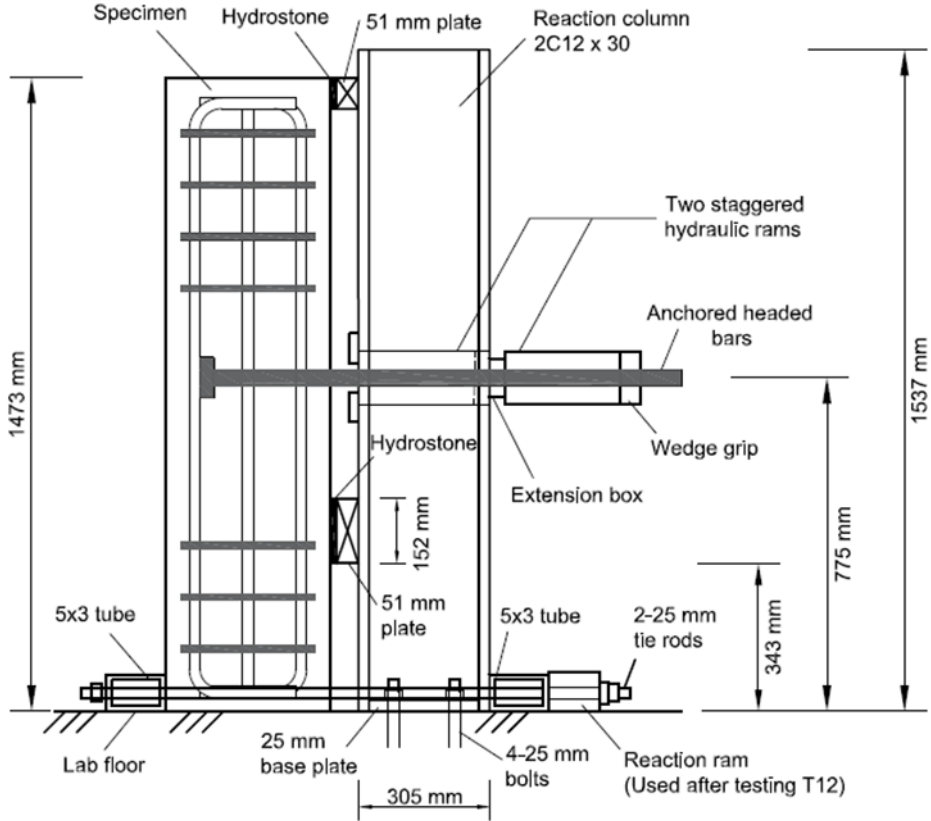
Test configuration for an exterior beam-column joint specimen (figure after Bashandy 1996)
